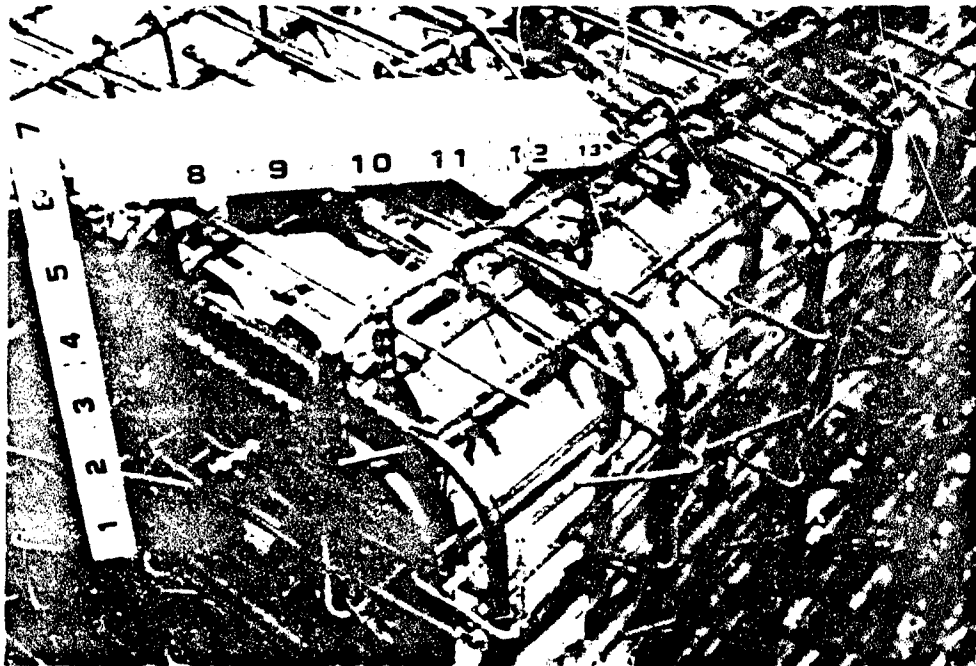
Close-up showing the galvanized steel decking and steel placement for the Type 1 element.
